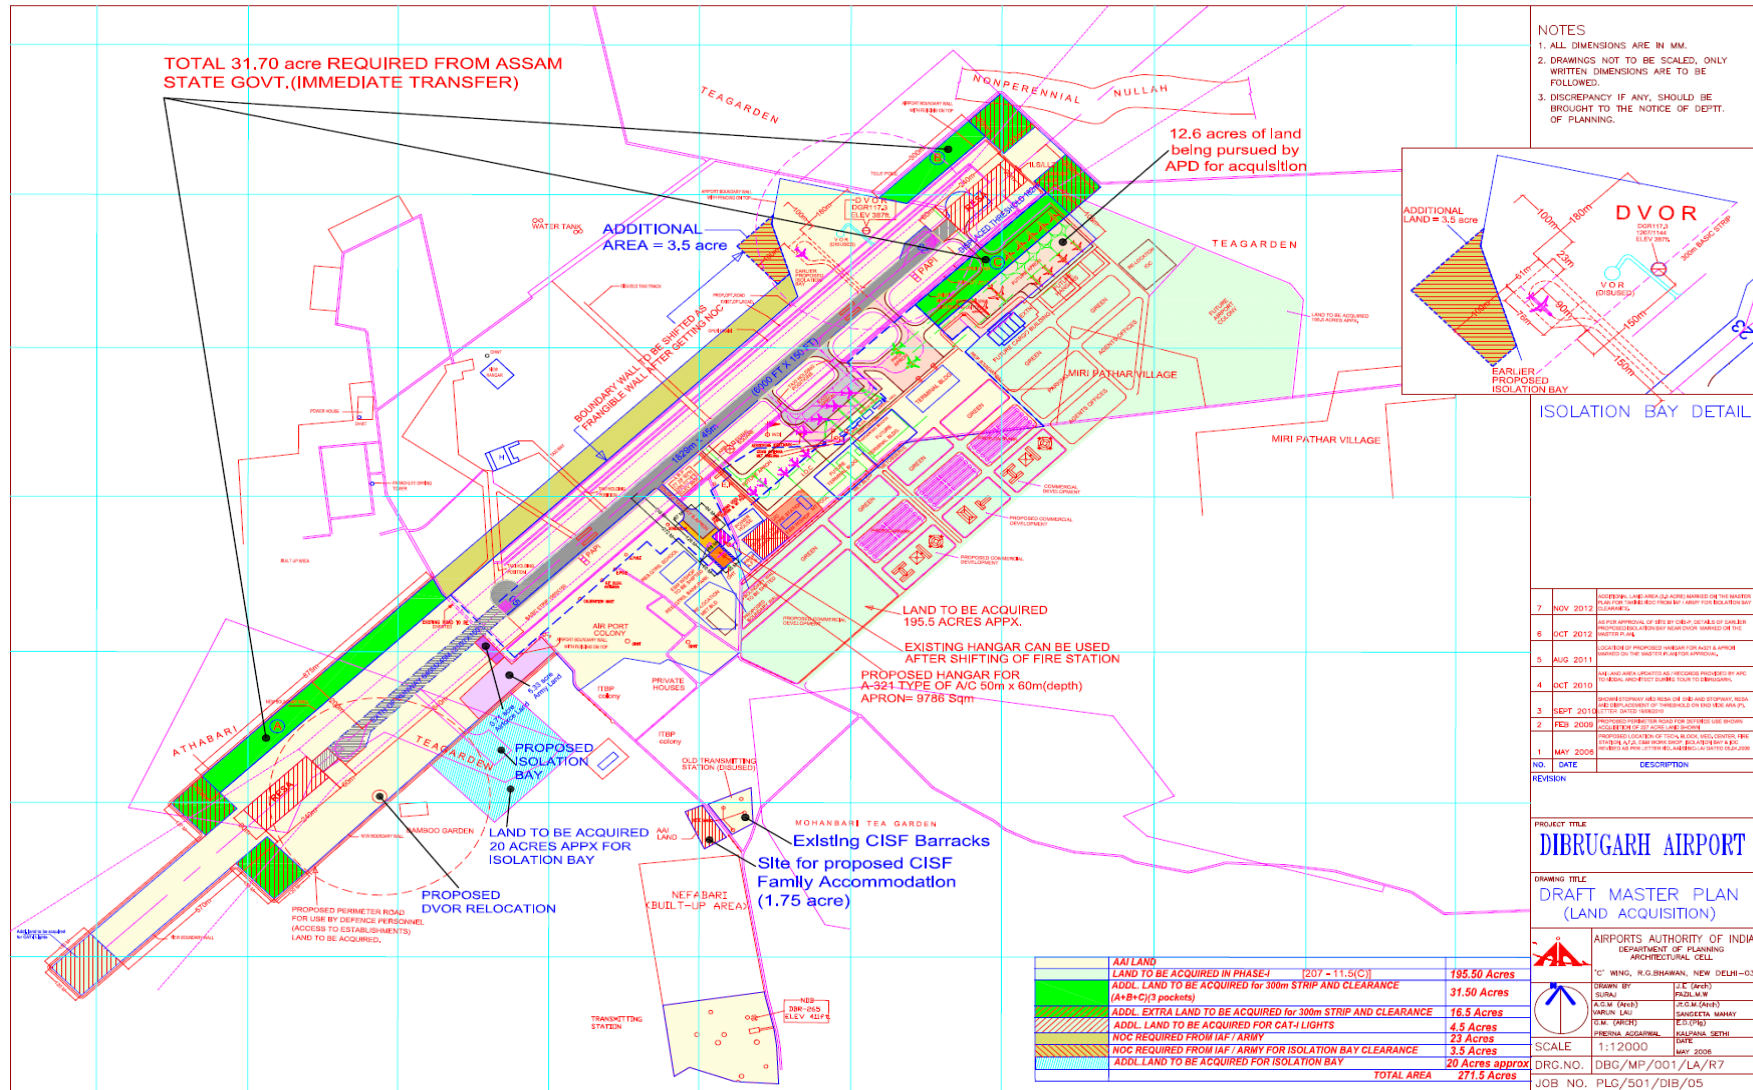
Master Plan showing Existing facilities and Proposed Runway
